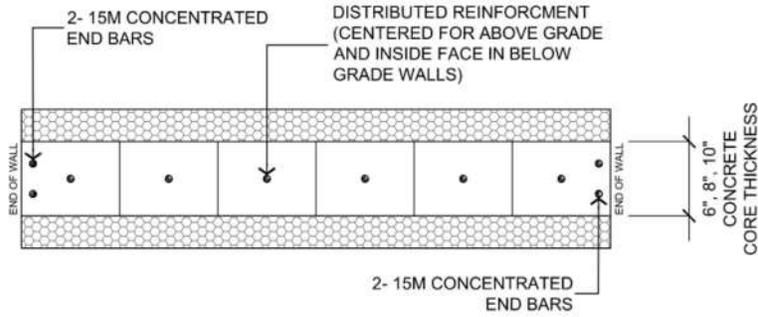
2. Walkout Basement Wall of a Two-Story Wood Framed Structure Supporting Wood Frame Floors and Roof (TYPE W2).
